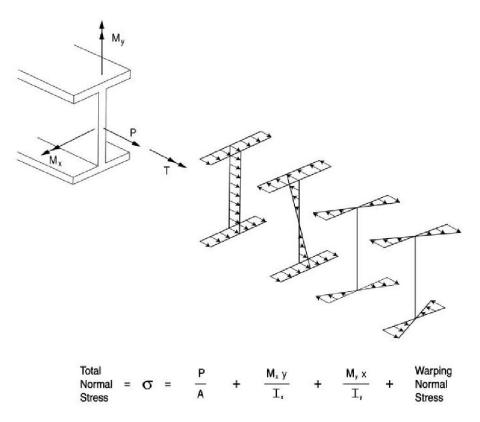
The general I-girder normal stresses, which can occur in a curved I-shaped girder
